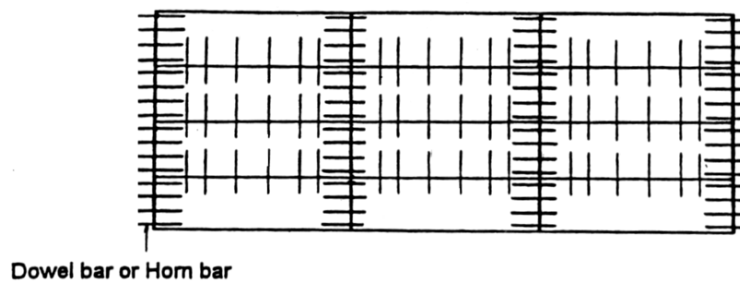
Slab layout for precast pavements in Japan (Ref 5)
